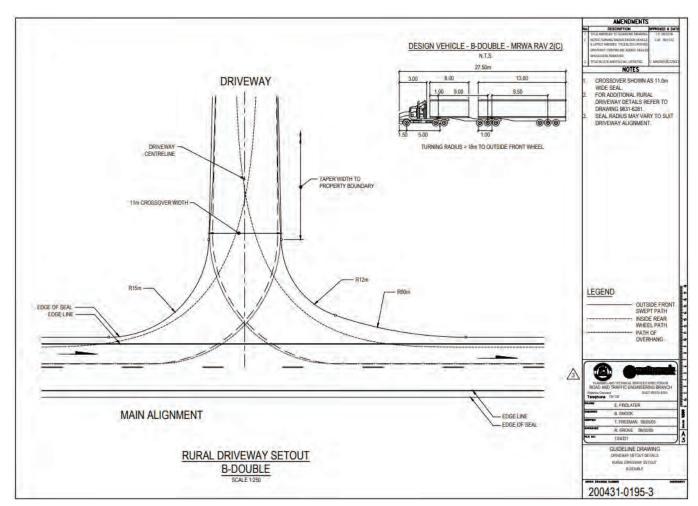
MRWA layout details for a rural driveway (B-Doubles up to 27.5 m)
